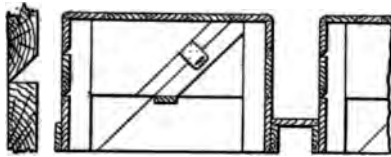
Slab and Girder Floor Forms, Pacific Borax Co.'s Factory.
